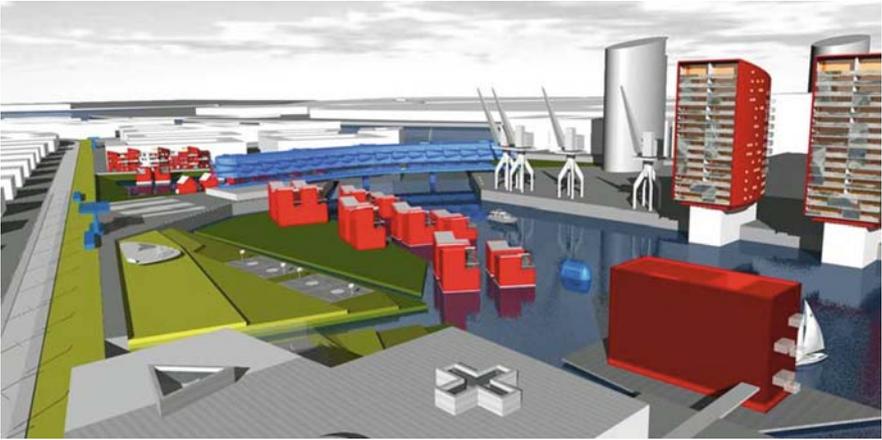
Visualisation of the plan (Source: Baca Architects, London, 2007)
